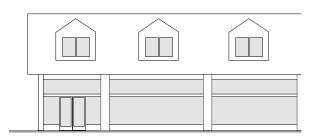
G. Pitched Roof on Single Story Commercial Center.
